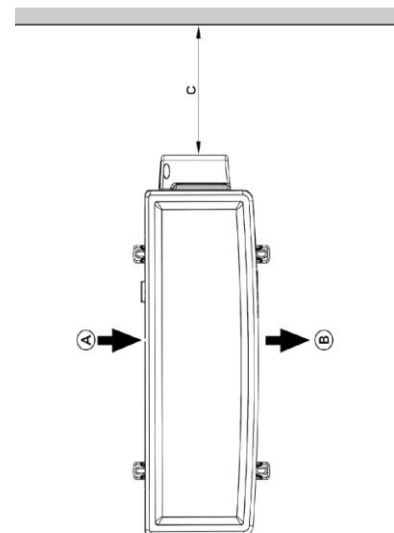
Possible installation of AIR BASIC 109 or AIR BASIC 211 outdoor unit
